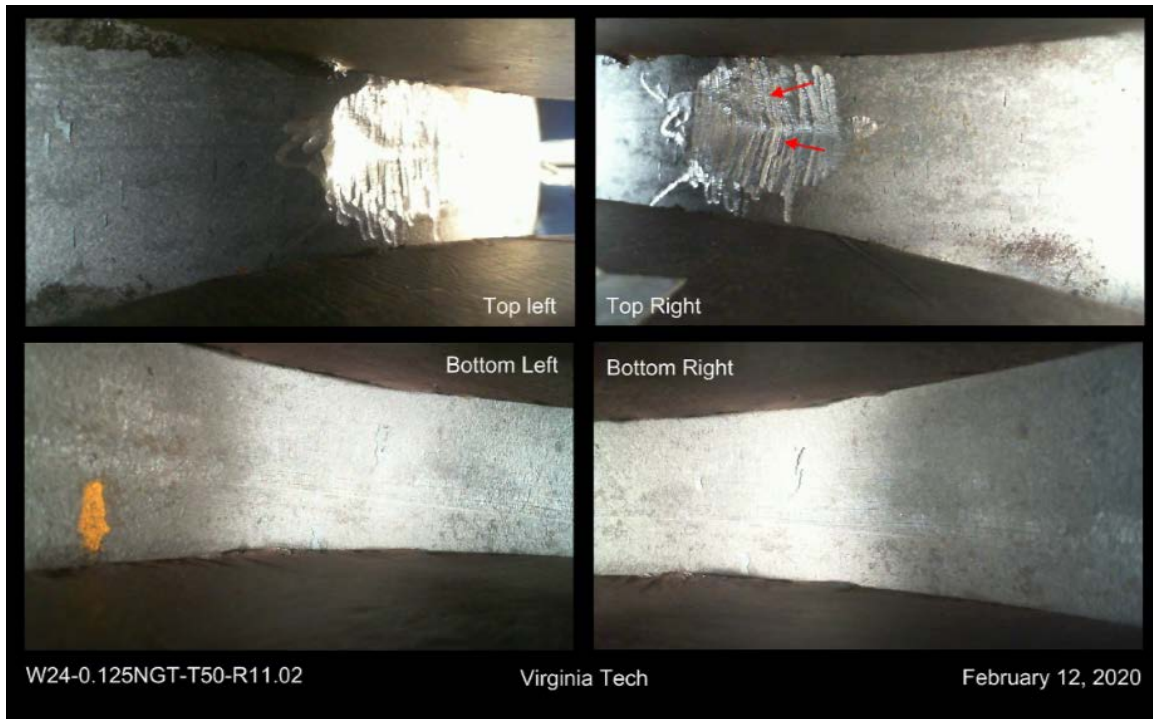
Fracture surfaces of W24-0.125NGT-T50-R11.01.
